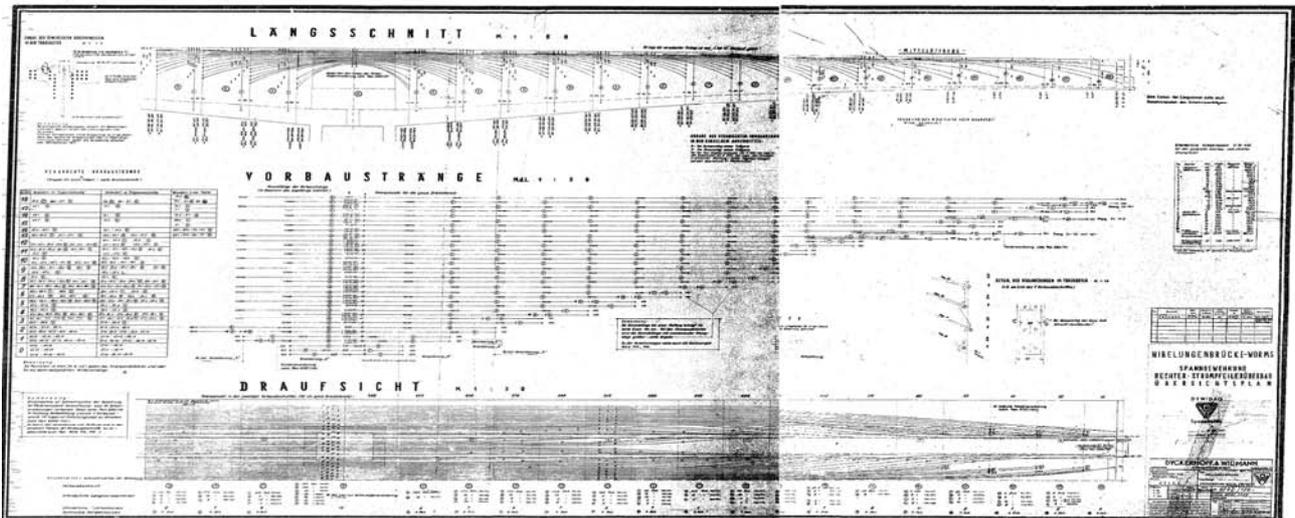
Original plan of the “prestressing iron” Nibelungen Bridge, Worms (Source: Landesbetrieb für Mobilität)
